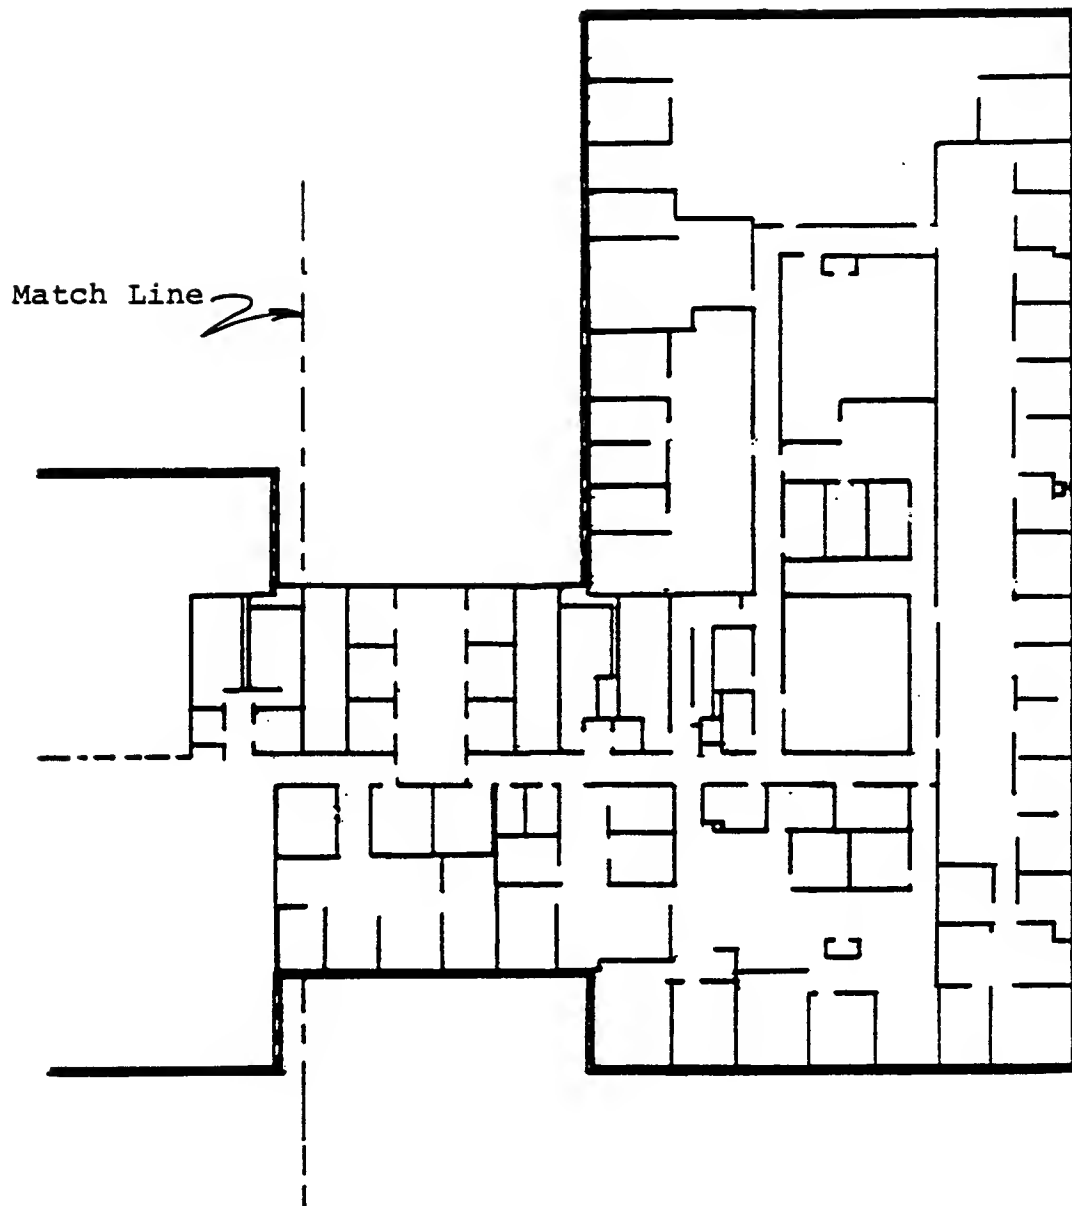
USIA BUILDING FIFTH FLOOR-NORTH
